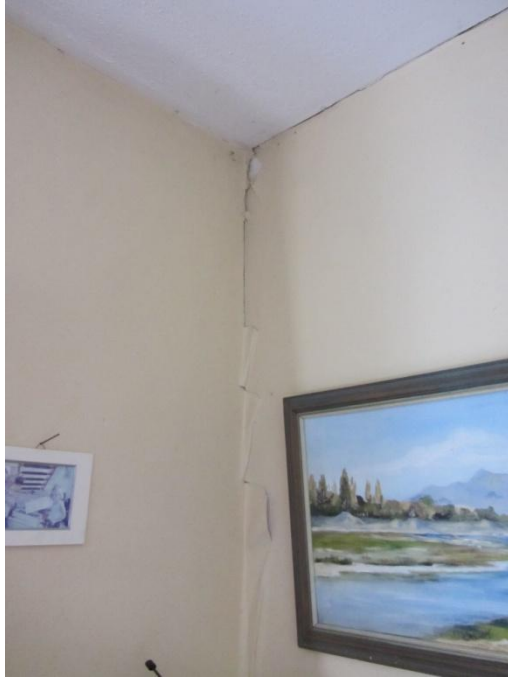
Cracking along Wall Lining in North-East Corner
